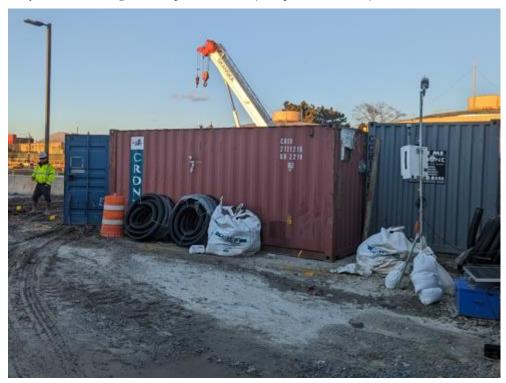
CAMP probe downwind located south of 2.5 acre BUD excavation area
